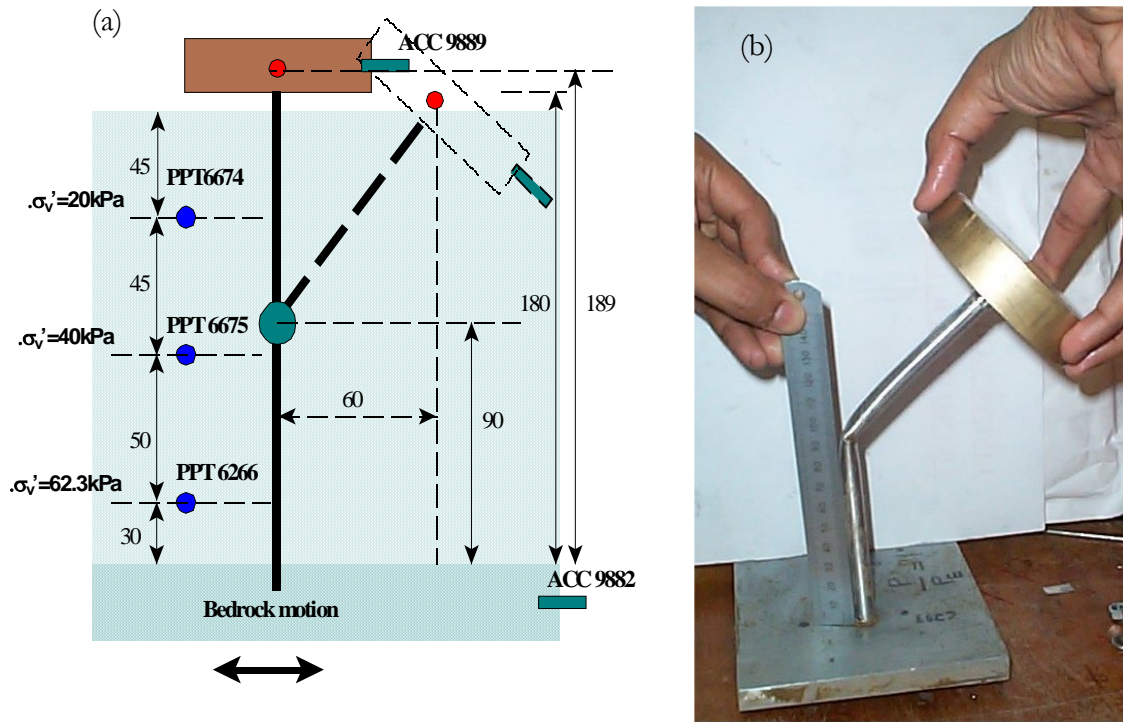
Pile 12; (a): Instrument layout surrounding the pile; (b) Final deformed shape.
